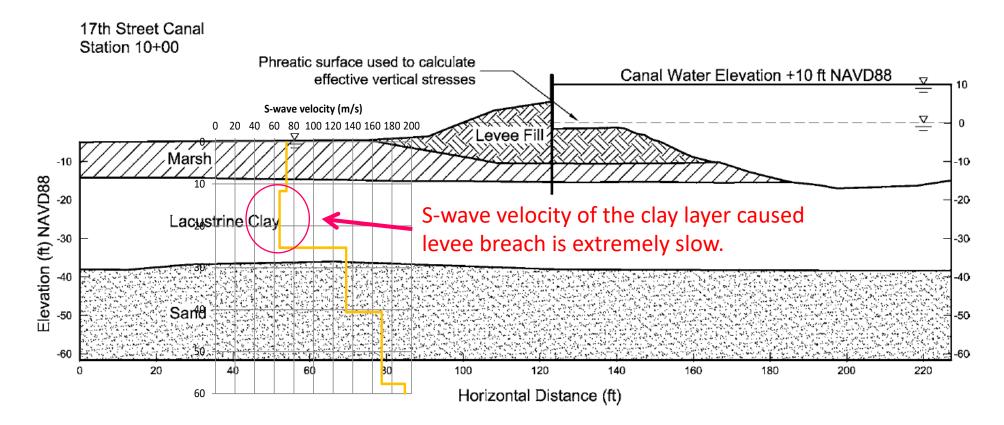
Cross section of 17th Street Canal I-wall at Station 10+00
